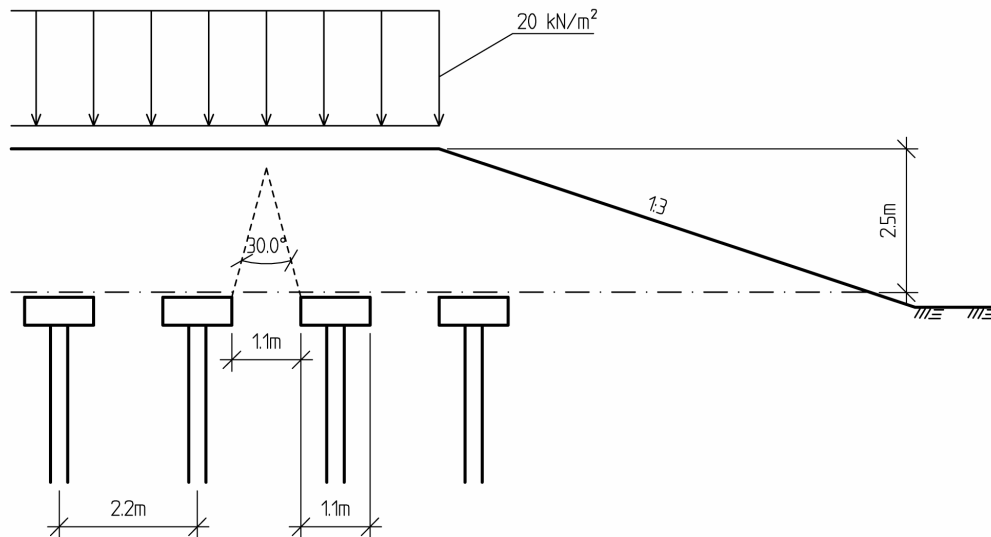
Reinforced piled embankment - design example with vertical piles or inclined piles below the slope
